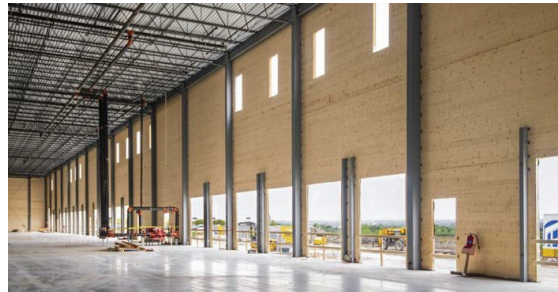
Southfield Park 35 warehouse, Dallas, Texas; Architect: PDMS Group; Engineer: Timberlab
